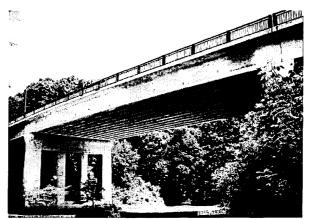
Completed Walnut Lane Bridge over Wissahickon Creek in Philadelphia
